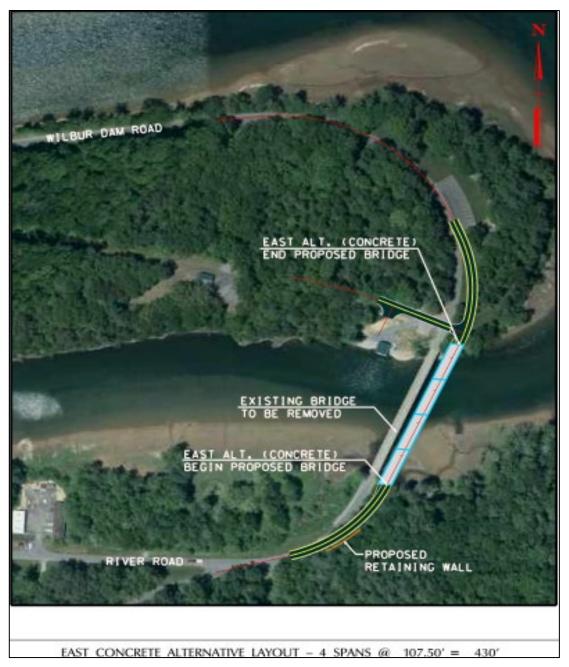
Depiction of a new concrete bridge alternative, aligned on the east side, or just downstream, of the existing Wilbur Reservoir Bridge
